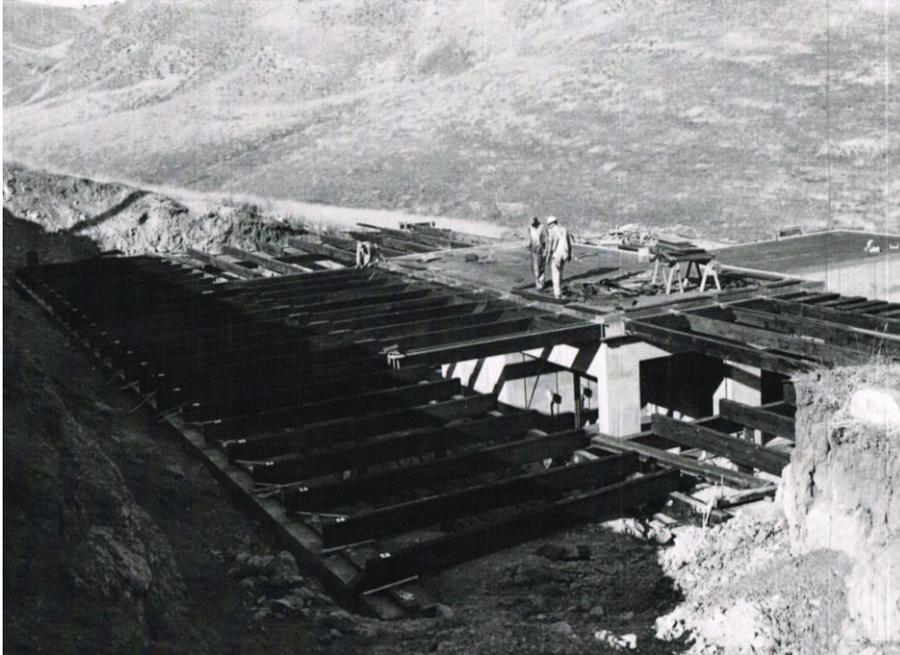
View of Building 825 under construction looking northeast as shrapnel baffles are installed, ca. 1958.
